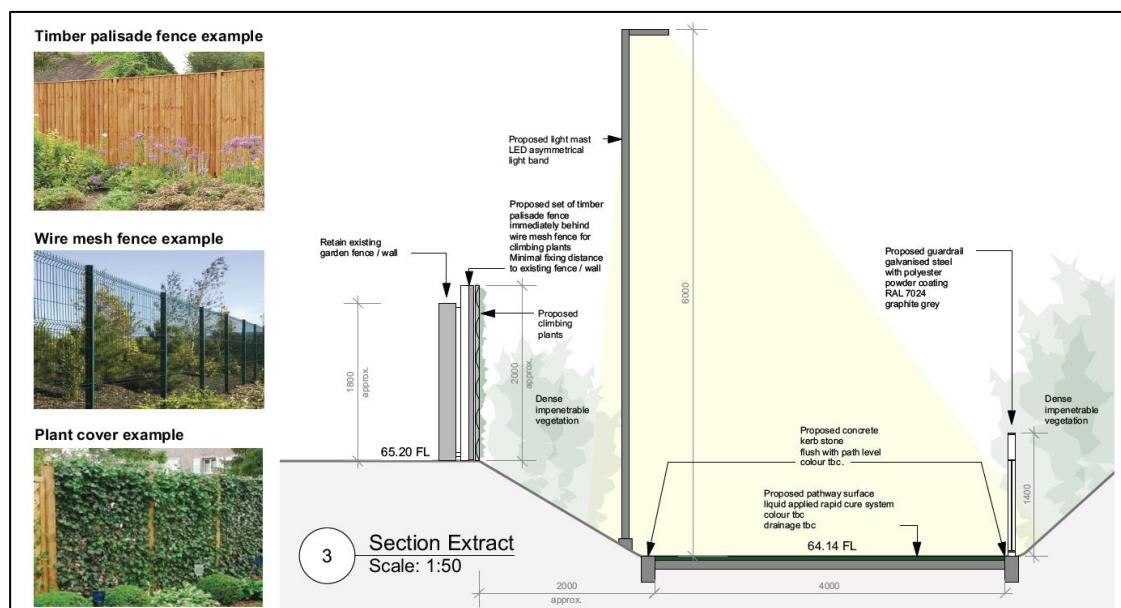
Cross section of greenway behind Delwood Park (Source: Architectural Drawings – Appendix B, Public Consultation Document)
